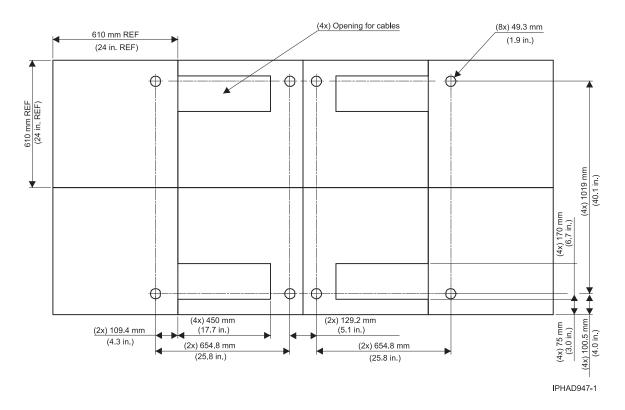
Eyebolt positioning for 610 mm (24 in.) floor tile layout
